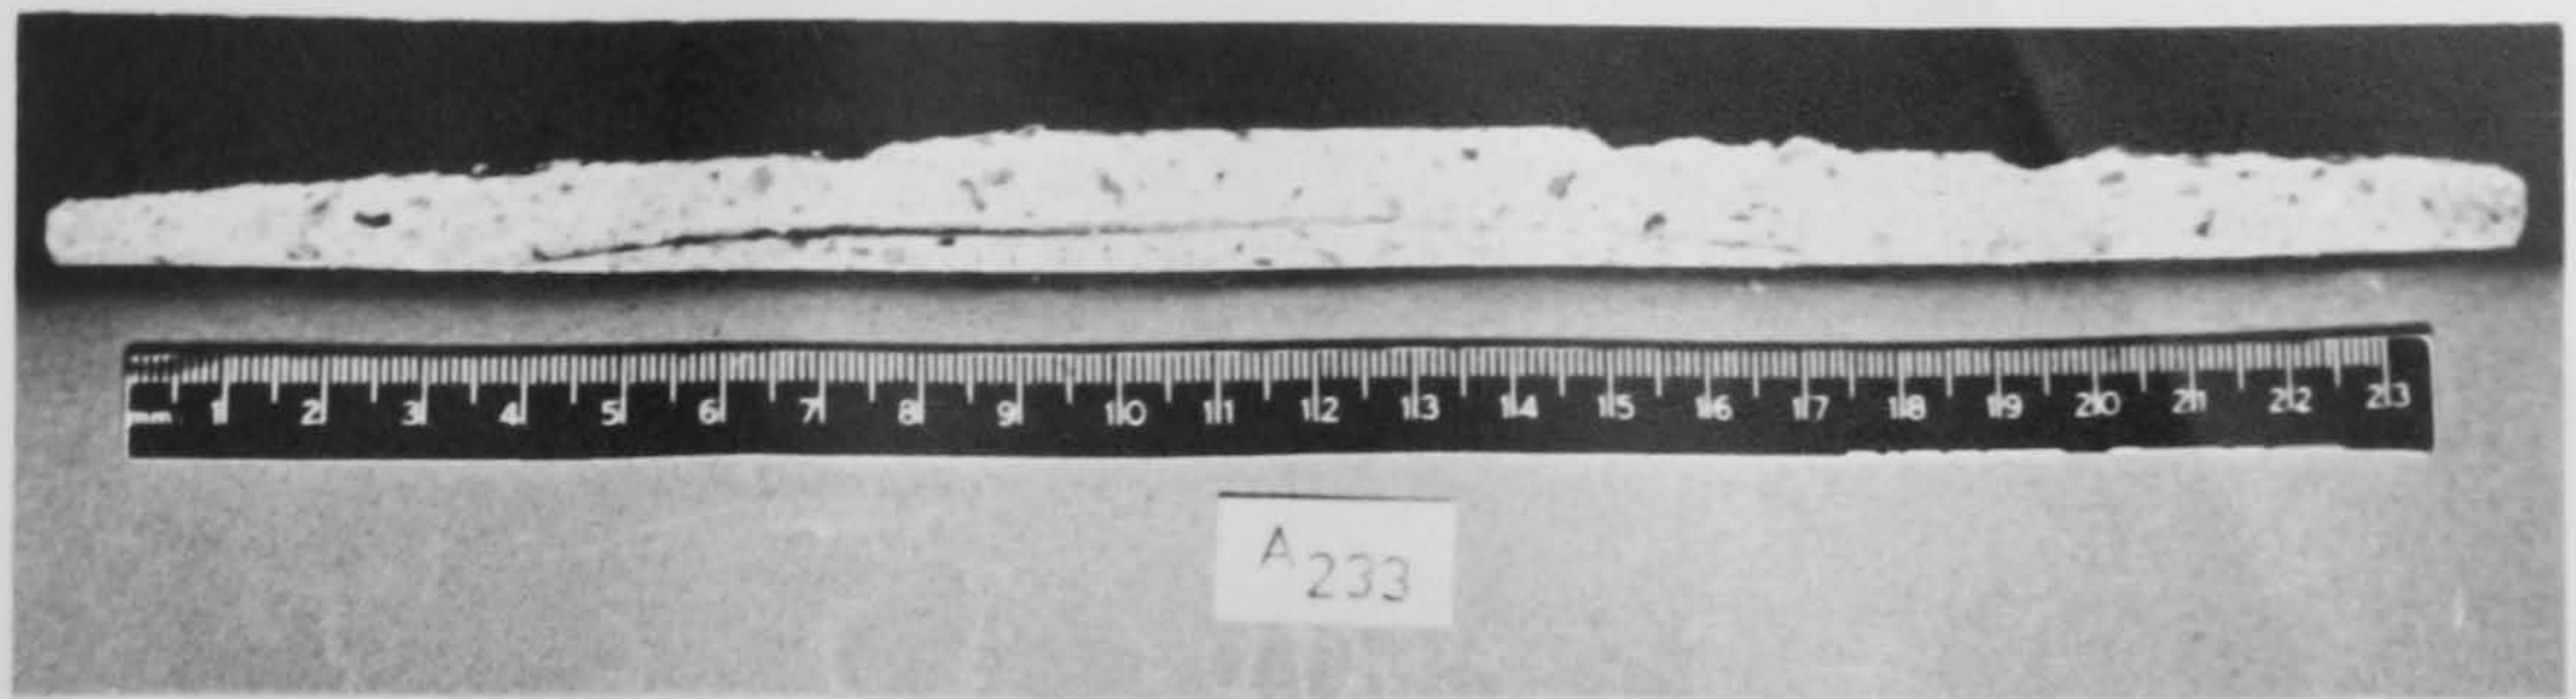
CROSS SECTIONS OF SPALLED PIECES FROM SPECIMENS TESTED WITH BIAXIAL LOADING
